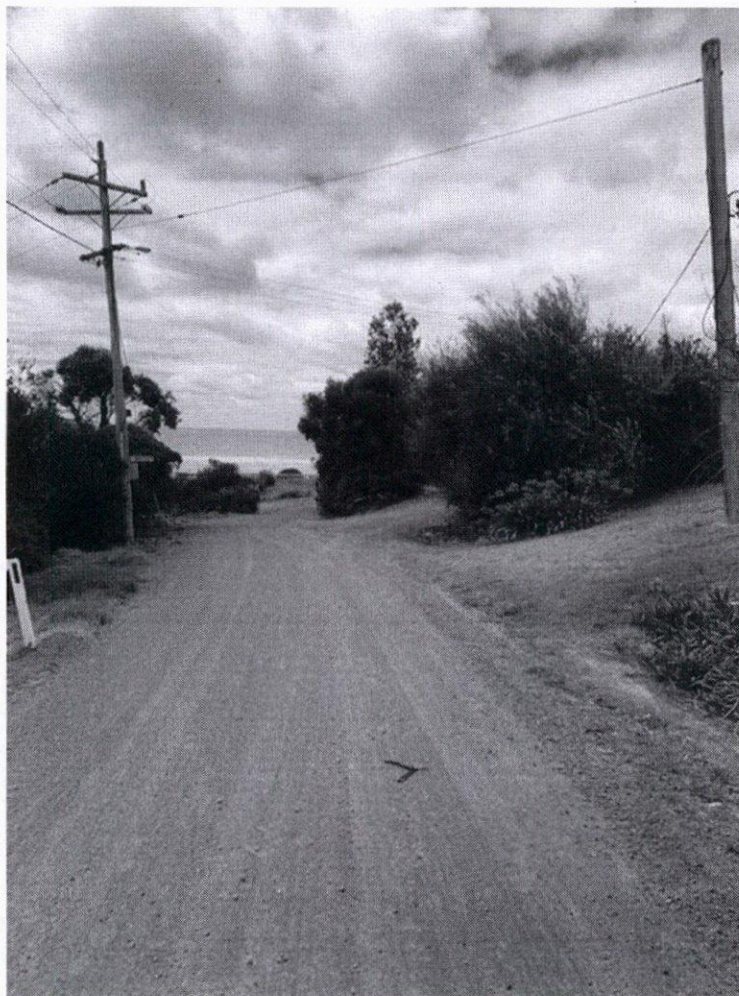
Skenes Creek Valley Road (facing south towards the beach)
